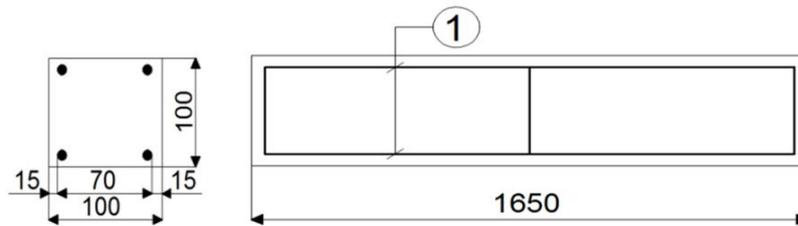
Scheme of reinforcement of fibreconcrete beams:
